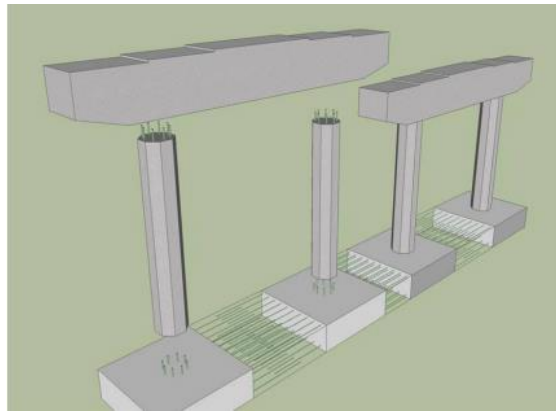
Precast open frame pier bent sketch from Utah DOT.* (Culmo M. P., 2011)
